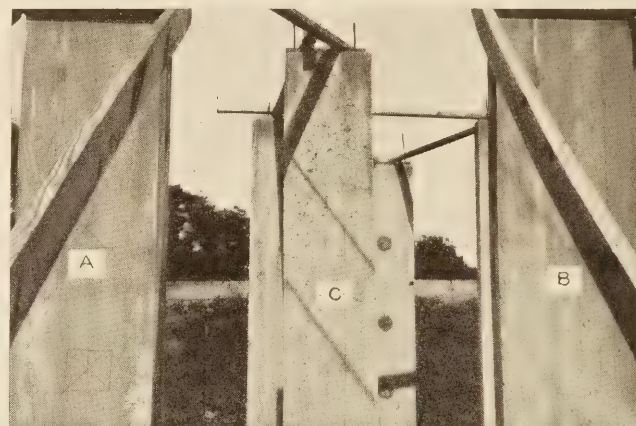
SHOWING PITTED SURFACE ON TOP OF CENTER COLUMN, A CONDITION TYPICAL OF VIBRATED COLUMNS. COLUMNS TO LEFT AND RIGHT SPADED
